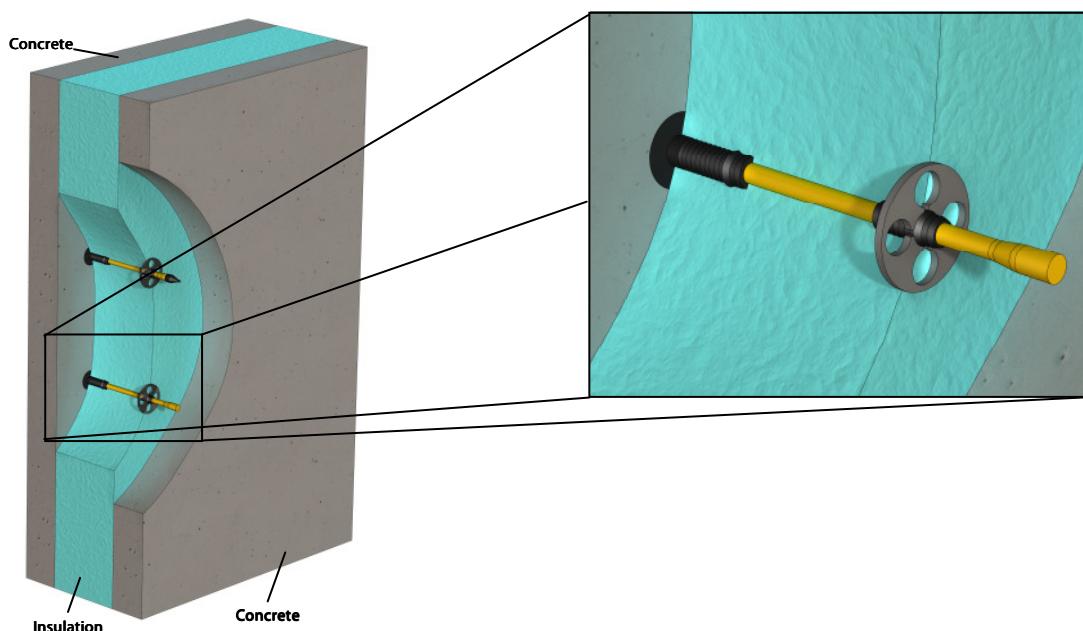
3D – view - prefabricated concrete sandwich wall.
